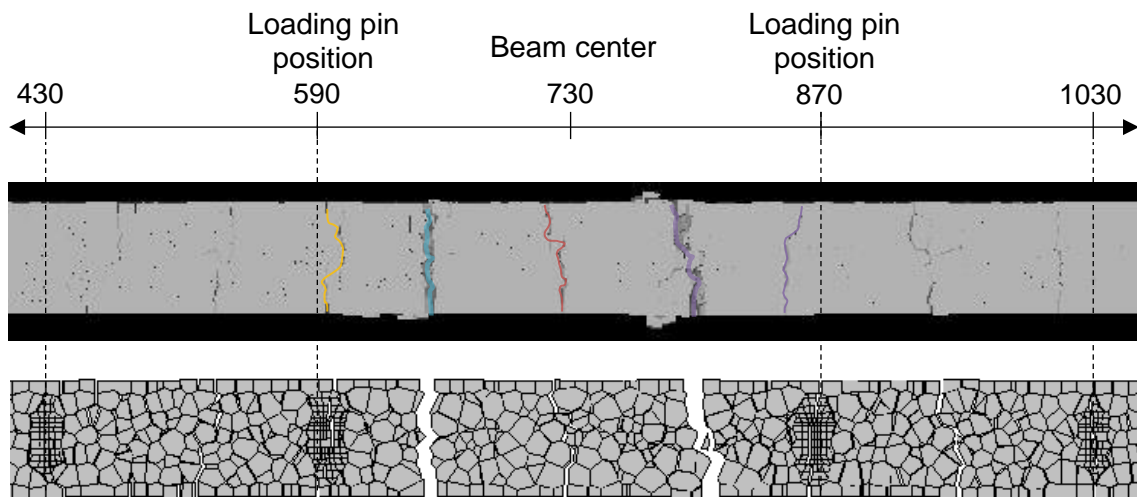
Bottom beam crack width after loading of no corrosion beam simulation
